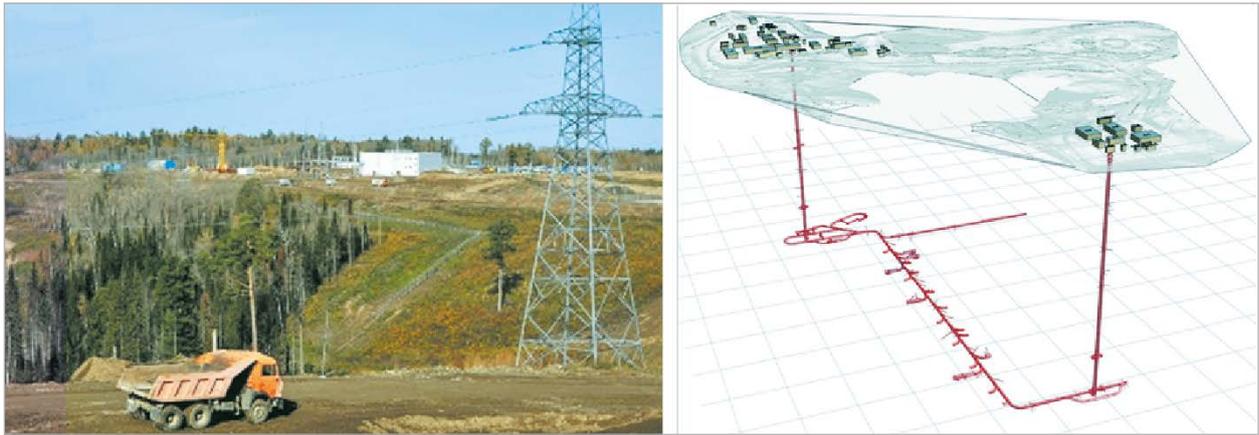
Construction site for the URL's 1st section and URL layout at the Yeniseiskiy site
